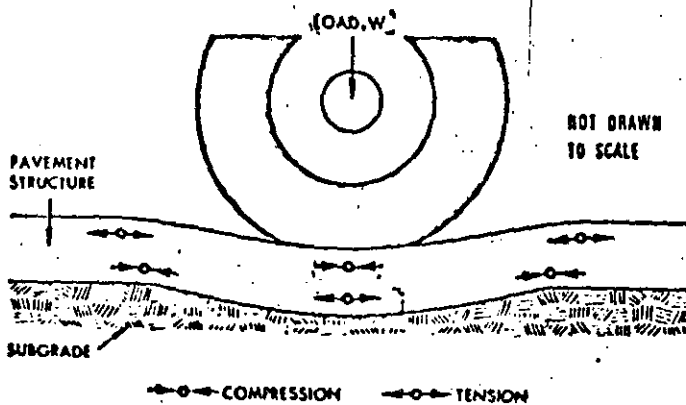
Pavement deflection results in tensile and compressive stresses in pavement structure
